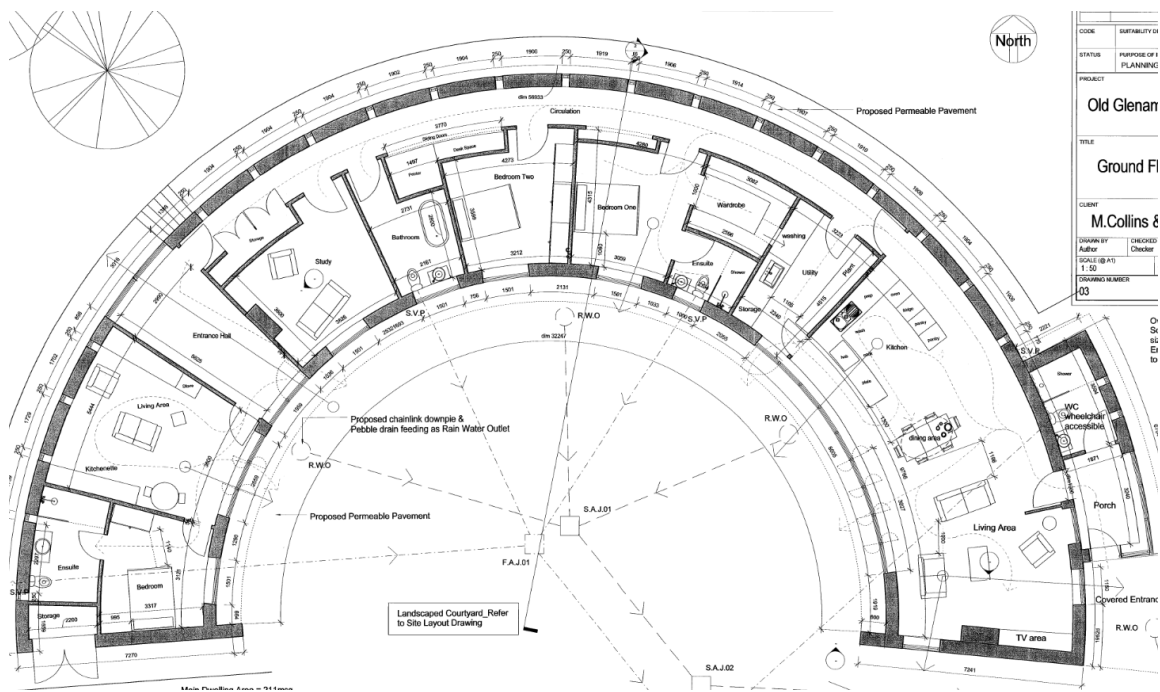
Extract from ground floor plan of permitted adjoining development. Note the narrow / slit type fenestration to the outer façade, with the main windows facing the internal courtyard.
